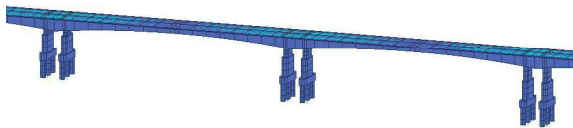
Construction stages and stressing were carried out using RM Bridge software
